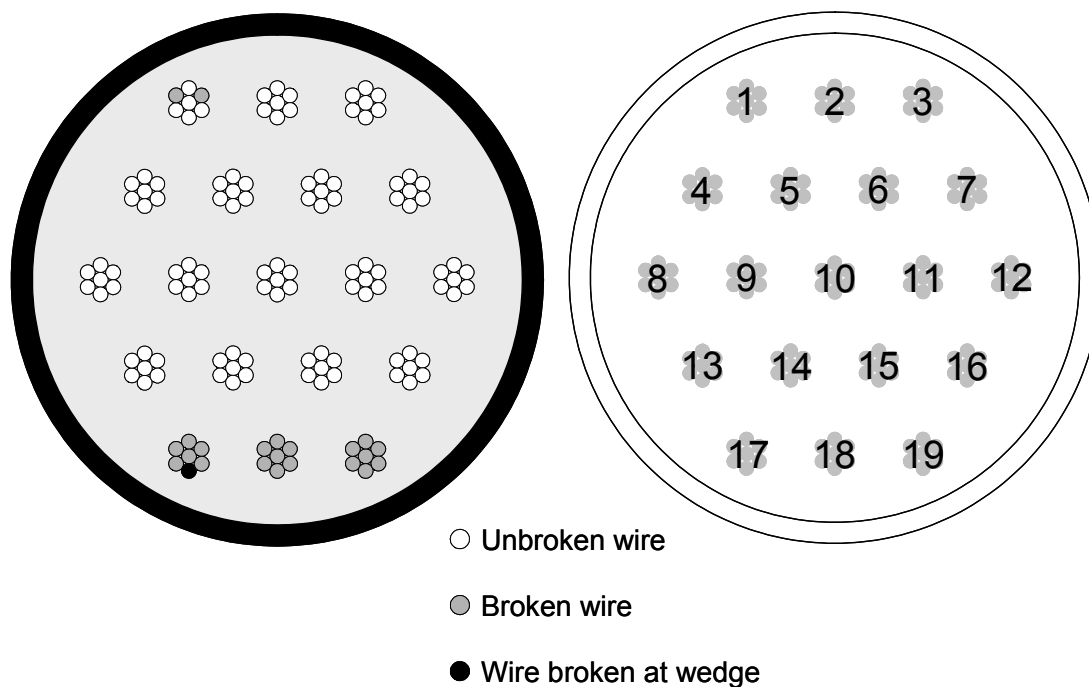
Wire breaks at the tower anchorage - Specimen 10
